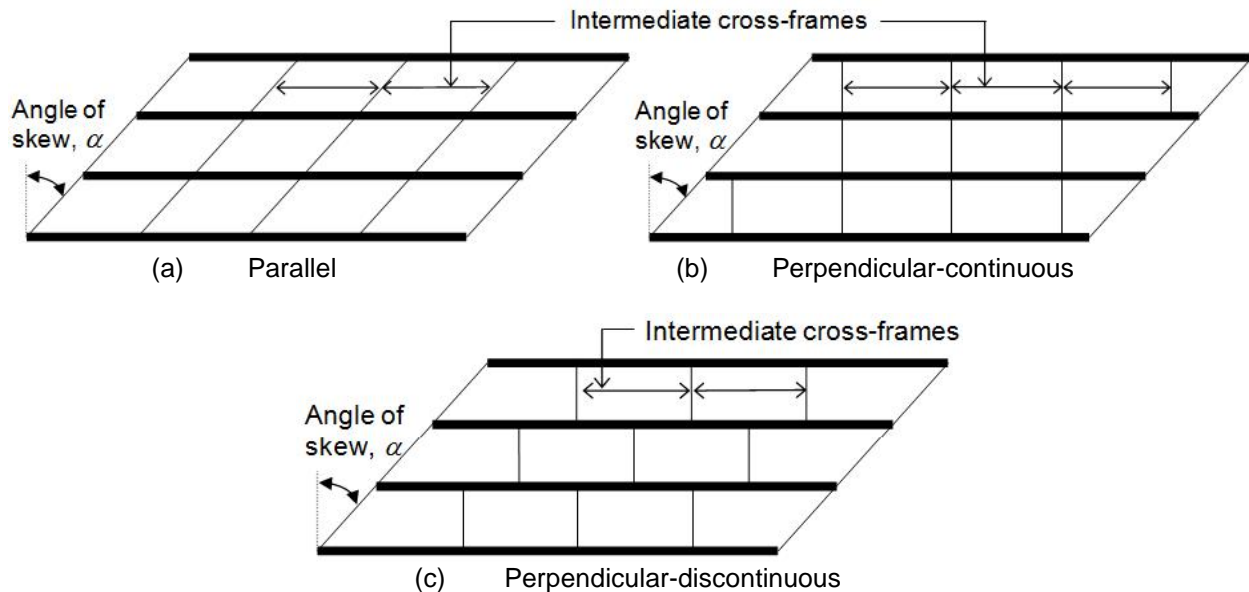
Cross-frame layouts for bridges with skewed supports for (a) parallel configuration; (b) perpendicular-continuous configuration; and (c) perpendicular-discontinuous configuration
